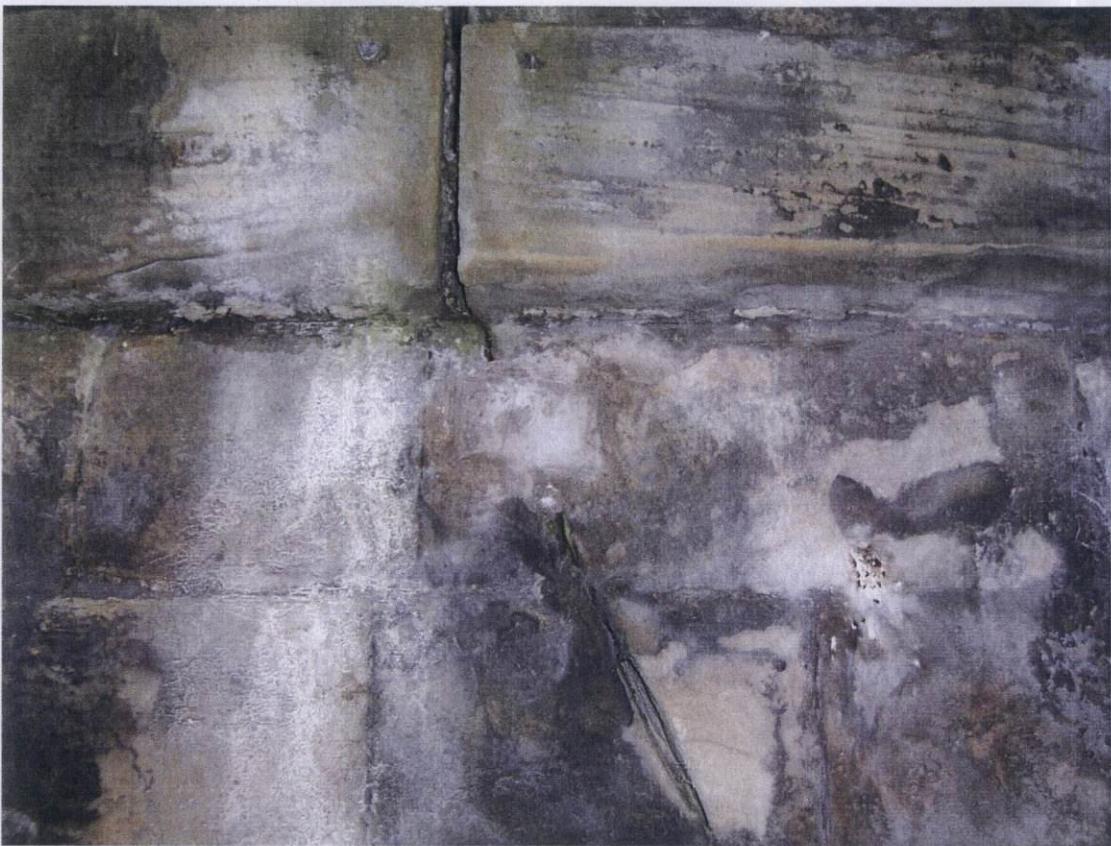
South arch south abutment. Vertical crack. Tell-tale position circled.
